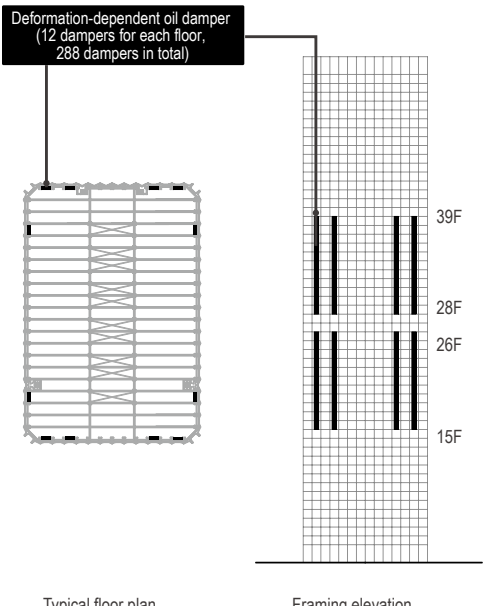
An example of the arrangement of dampers (Shinjuku Center Building, Drawing: Taisei Corporation)
